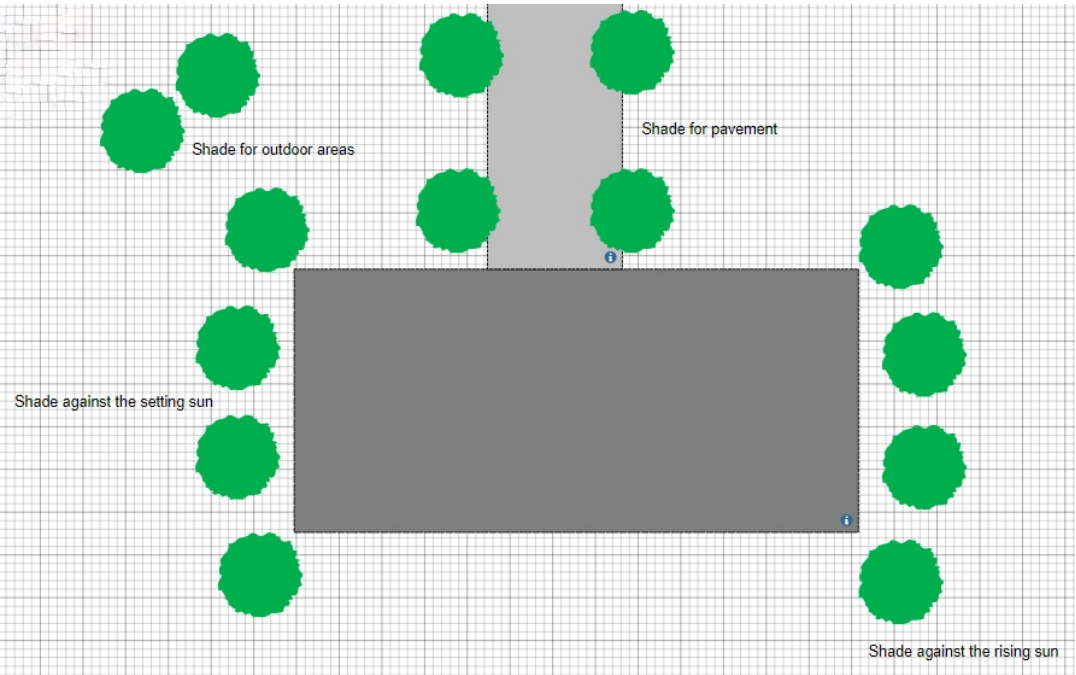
Ideal building layout plan with trees (Modified from [20])
